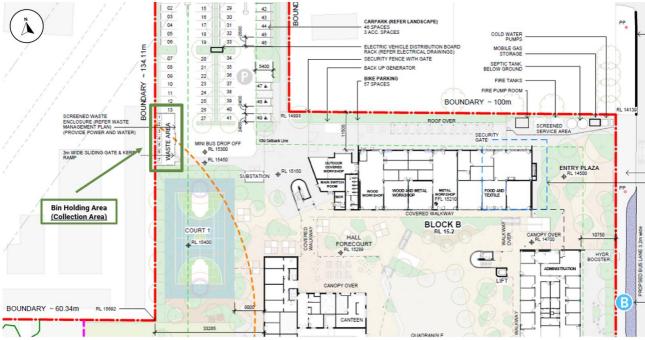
Extract of Ground Floor Plan - Waste Area outlined in Green (Source: NBRS)
